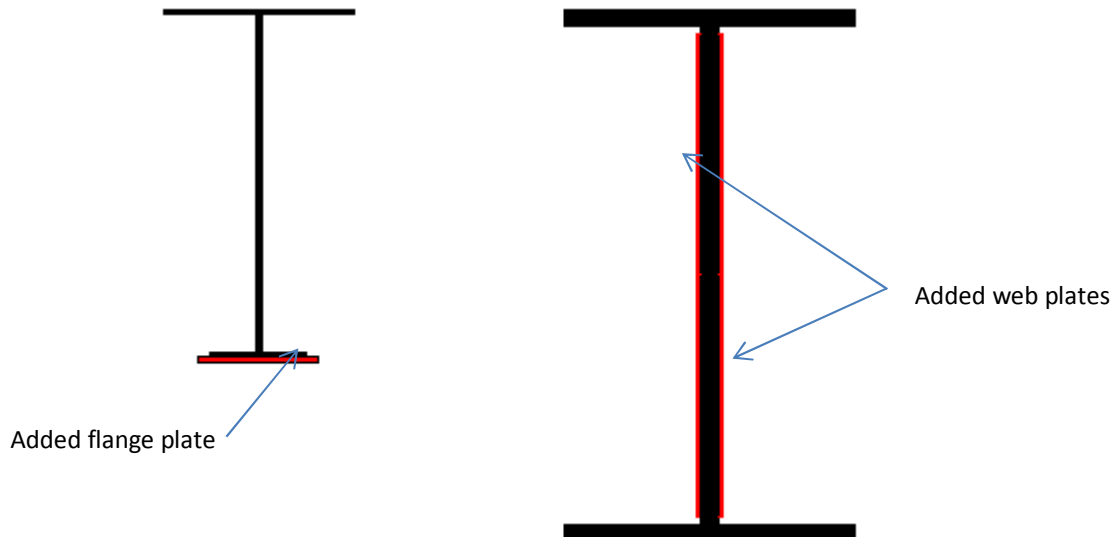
Adaptation welded profiles; transverse girder (left) and curved arch (right)
